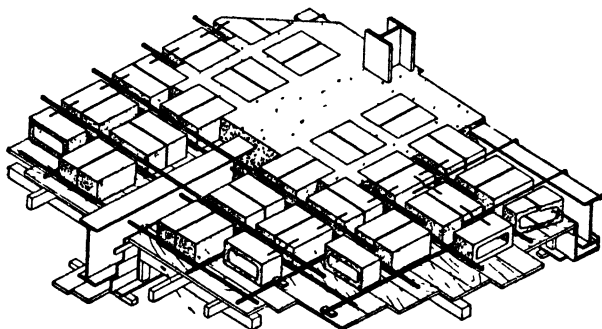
Two-way System—Concrete Blocks Alternating with Concrete Ribs
